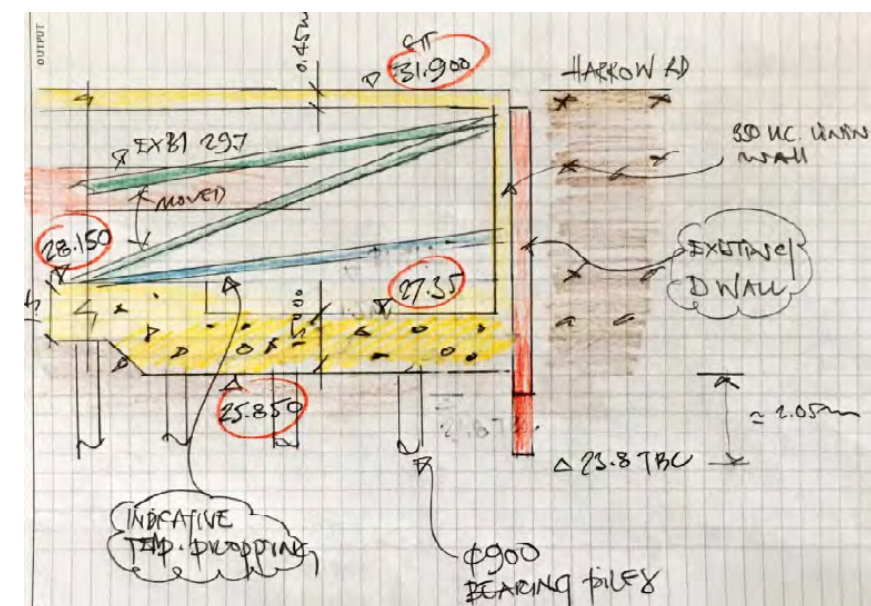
Typical Section – Existing D Wall and Proposed Single level Basement
